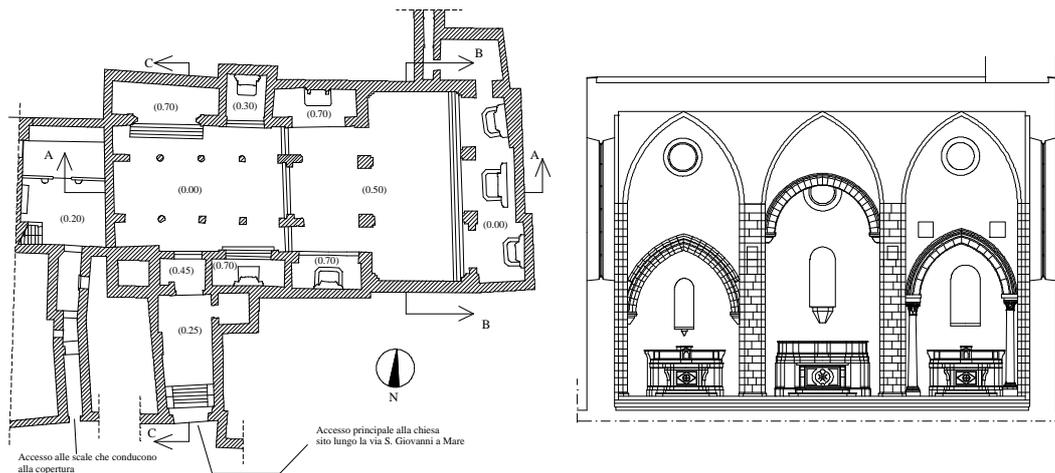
Plan and section at the triumphal arch of the san Giovanni a Mare church.
